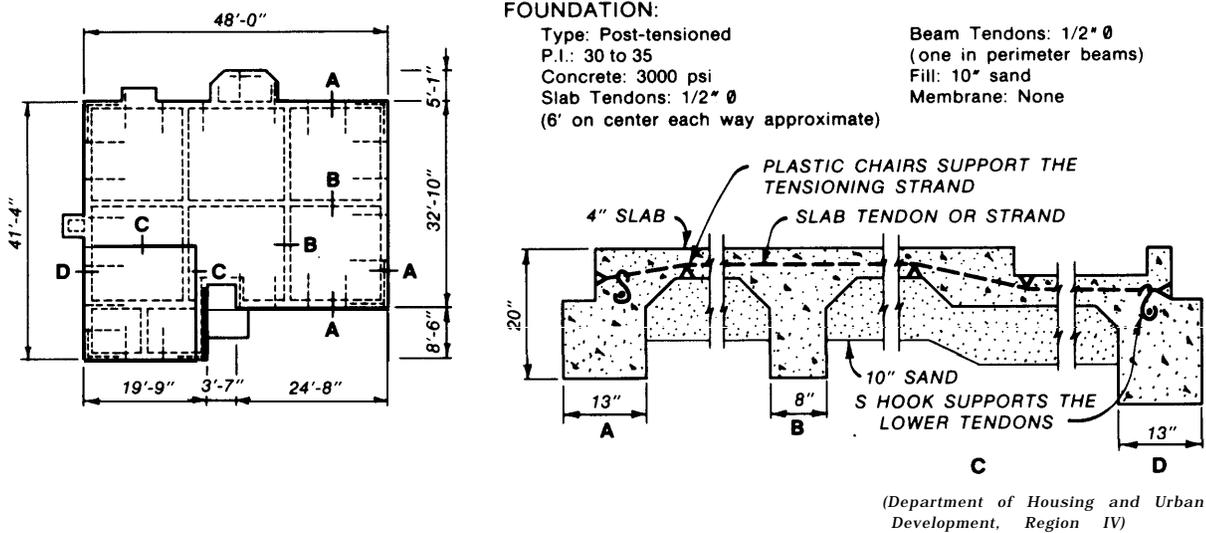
Post-tensioned slab in Lubbock, Texas, for single-family, single-story, minimally loaded frame residence.
